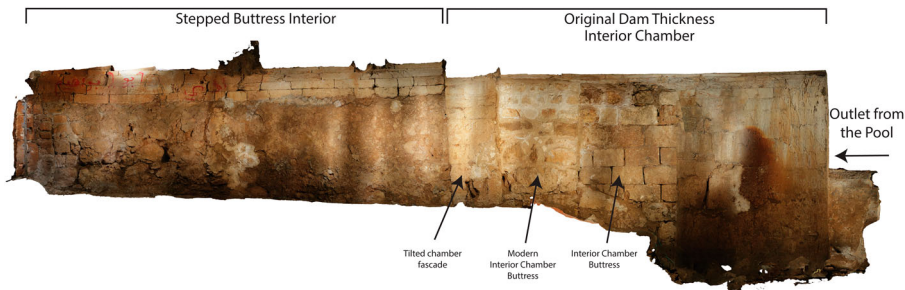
Orthophotographic section through the Dam passageway and interior chamber, facing south.
